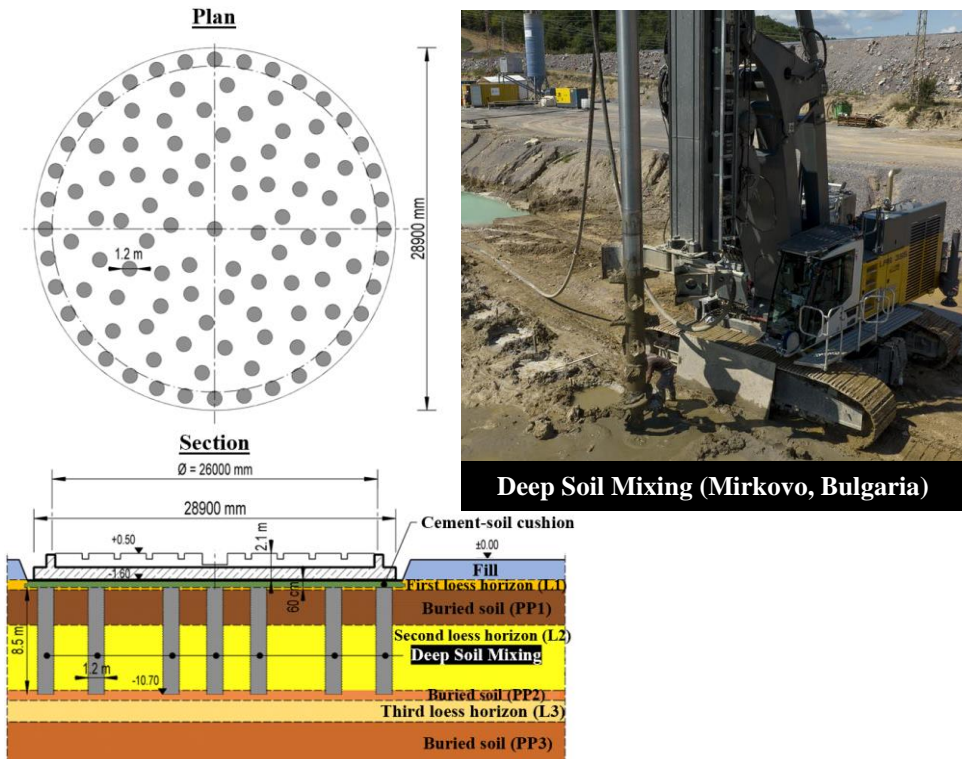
Option 2: single mat foundation, thin cement-soil cushion and deep soil mixing columns
